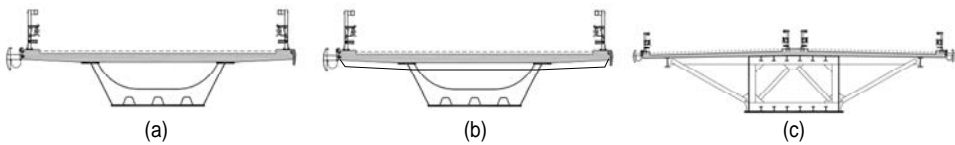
(a) Open box girder; (b) box girder directly supporting cross-beams with cantilevers and (c) box girder directly supporting cross-beam with propped cantilevers.
